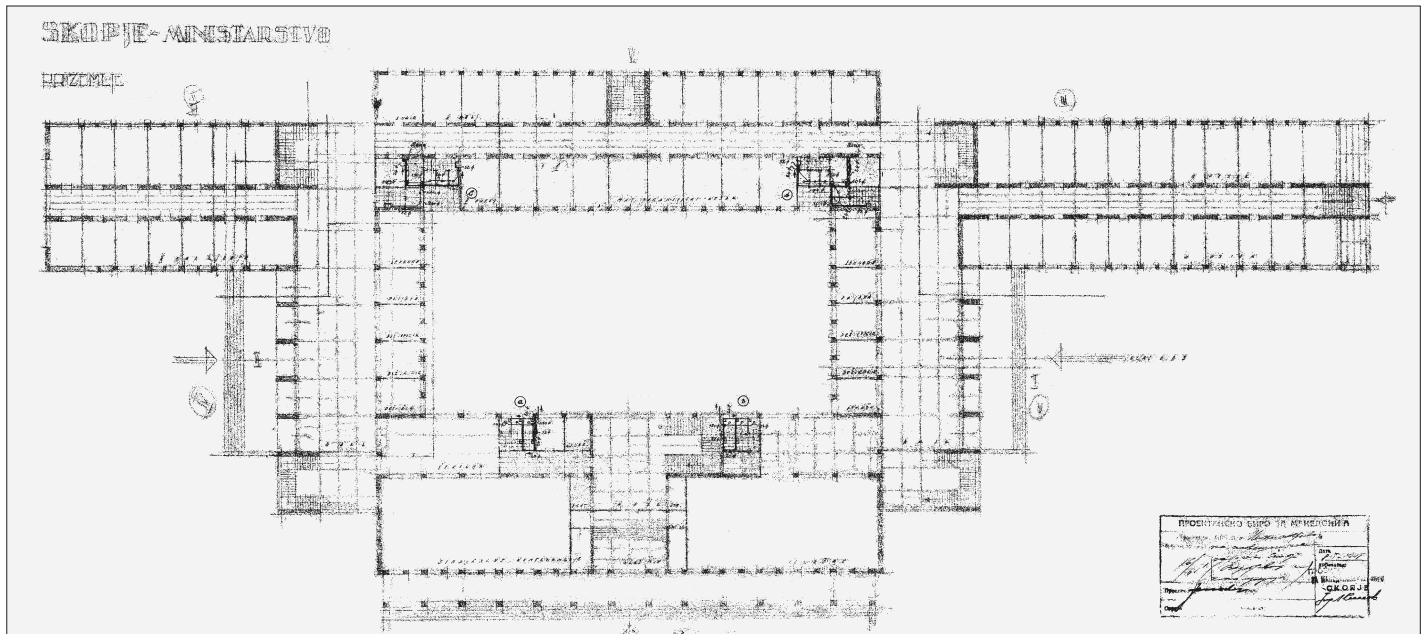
SKOPJE – MINISTRY, DRAFT FOR THE SEWAGE SYSTEM, GROUND FLOOR PLAN, 1948
